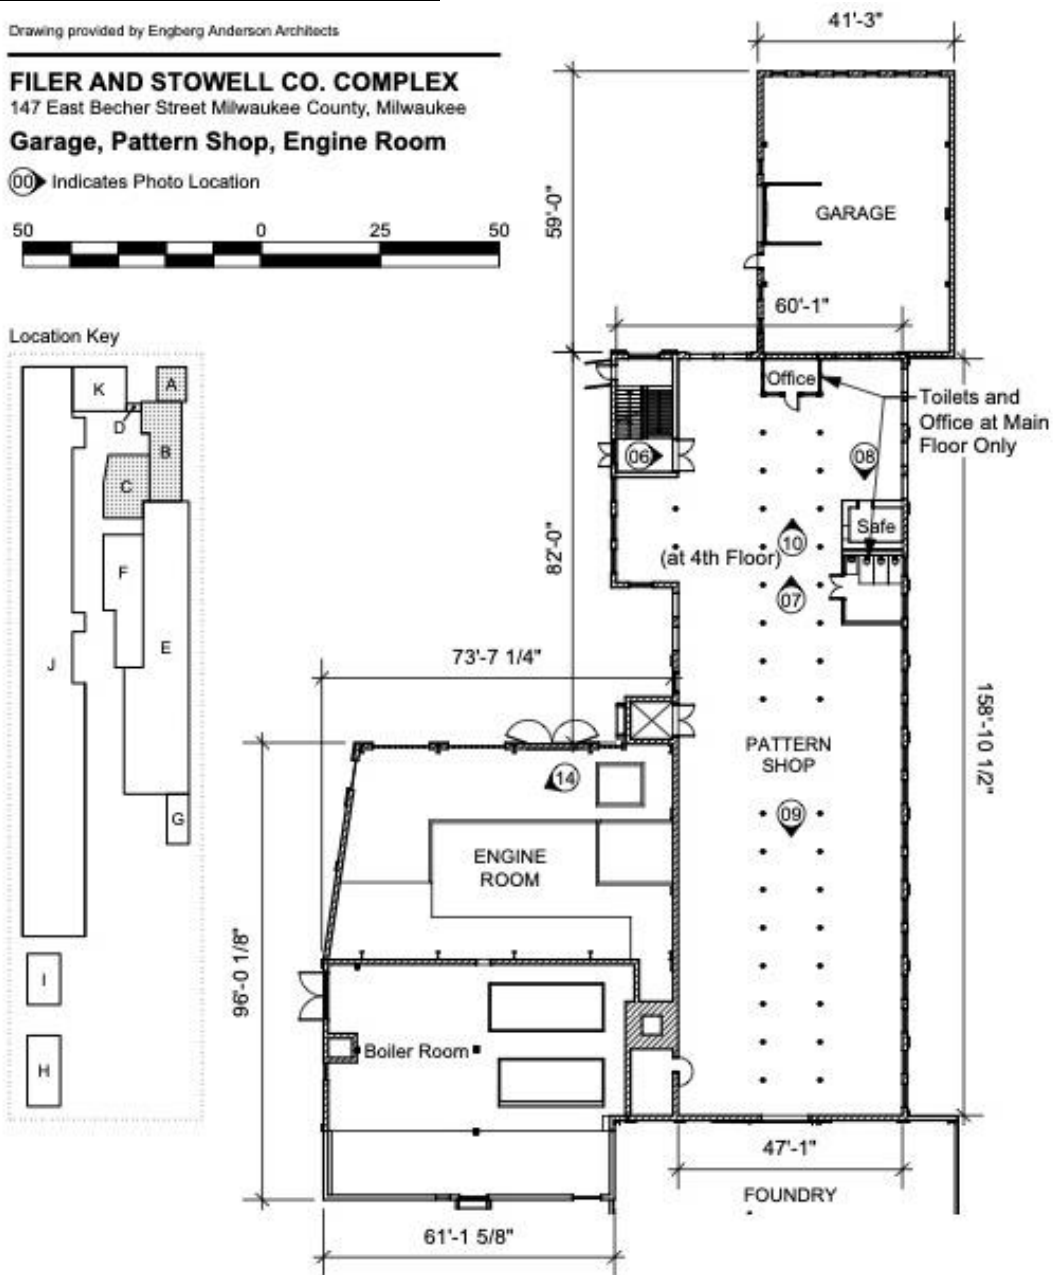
Floor Plans, Garage, Pattern Shop, Engine Room. The Pattern Shop has a similar floor plan on all floors.
